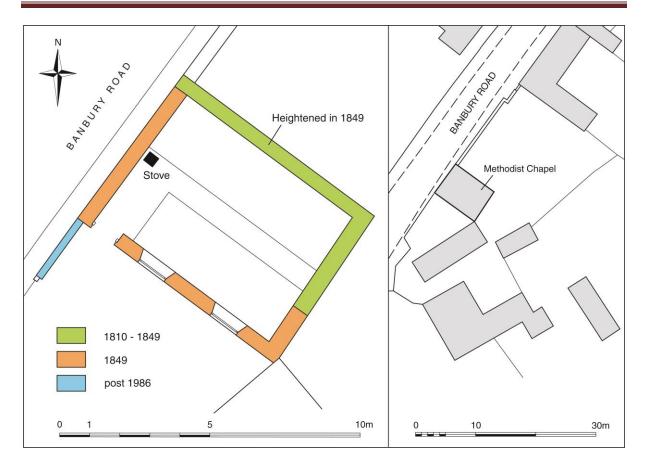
Phased plan of the building with the plot layout (Andy Isham after Roger Coy Partnership)
